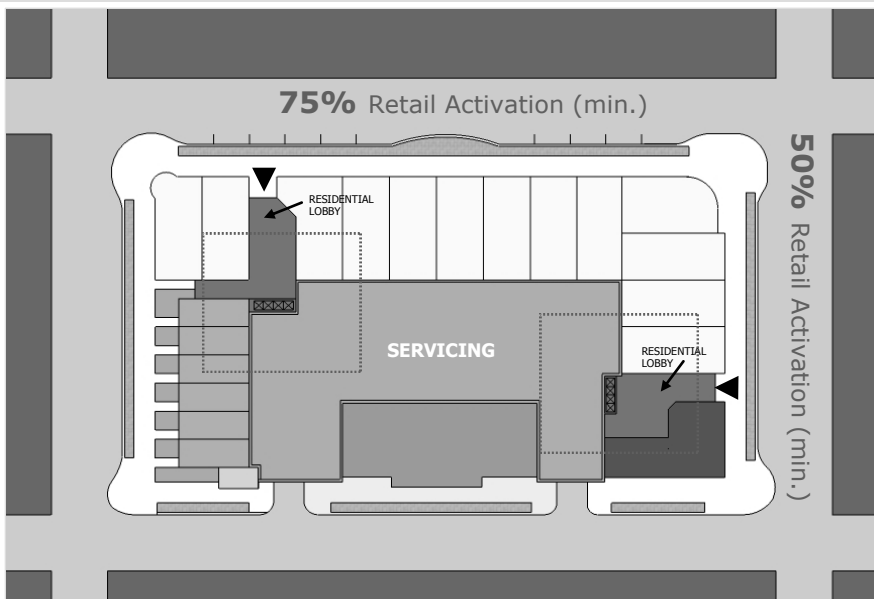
Main front entrances serving residential uses above the ground floor will be located to minimize interruption of retail units along blocks (Retail Activation Streets) and limited to a maximum of 6.5 m. Also refer to Downtown Core Local Area Plan policies and Retail Activation Schedule.
